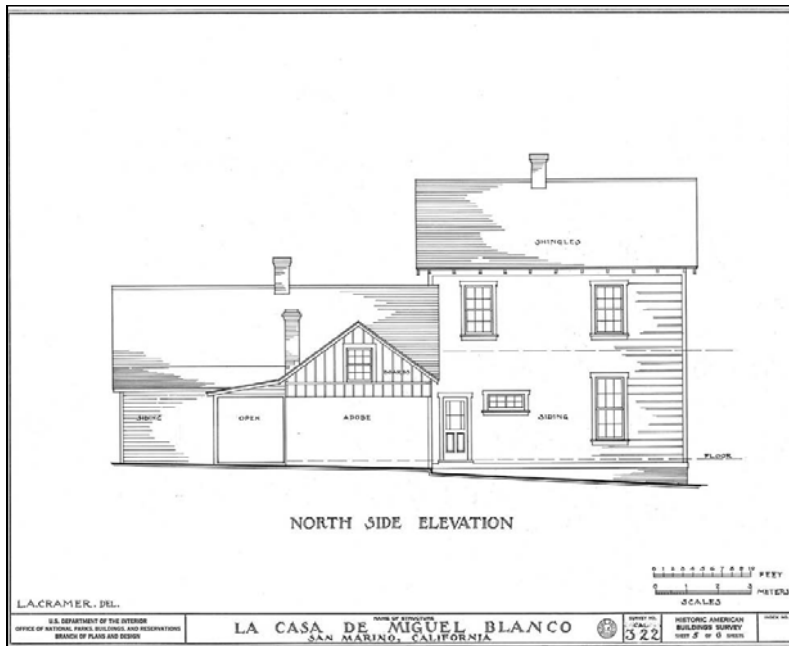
Drawing of "North Side Elevation" (Historic American Building Survey, 1936)
